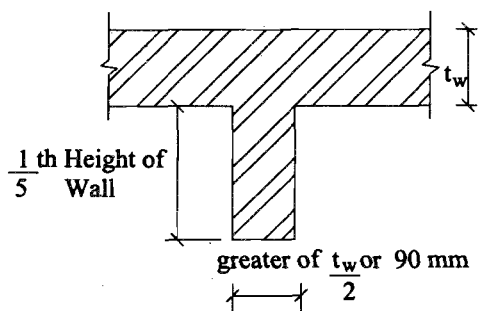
Minimum Dimension for Masonry Wall / Buttress / Pier Providing Effective Lateral Support
